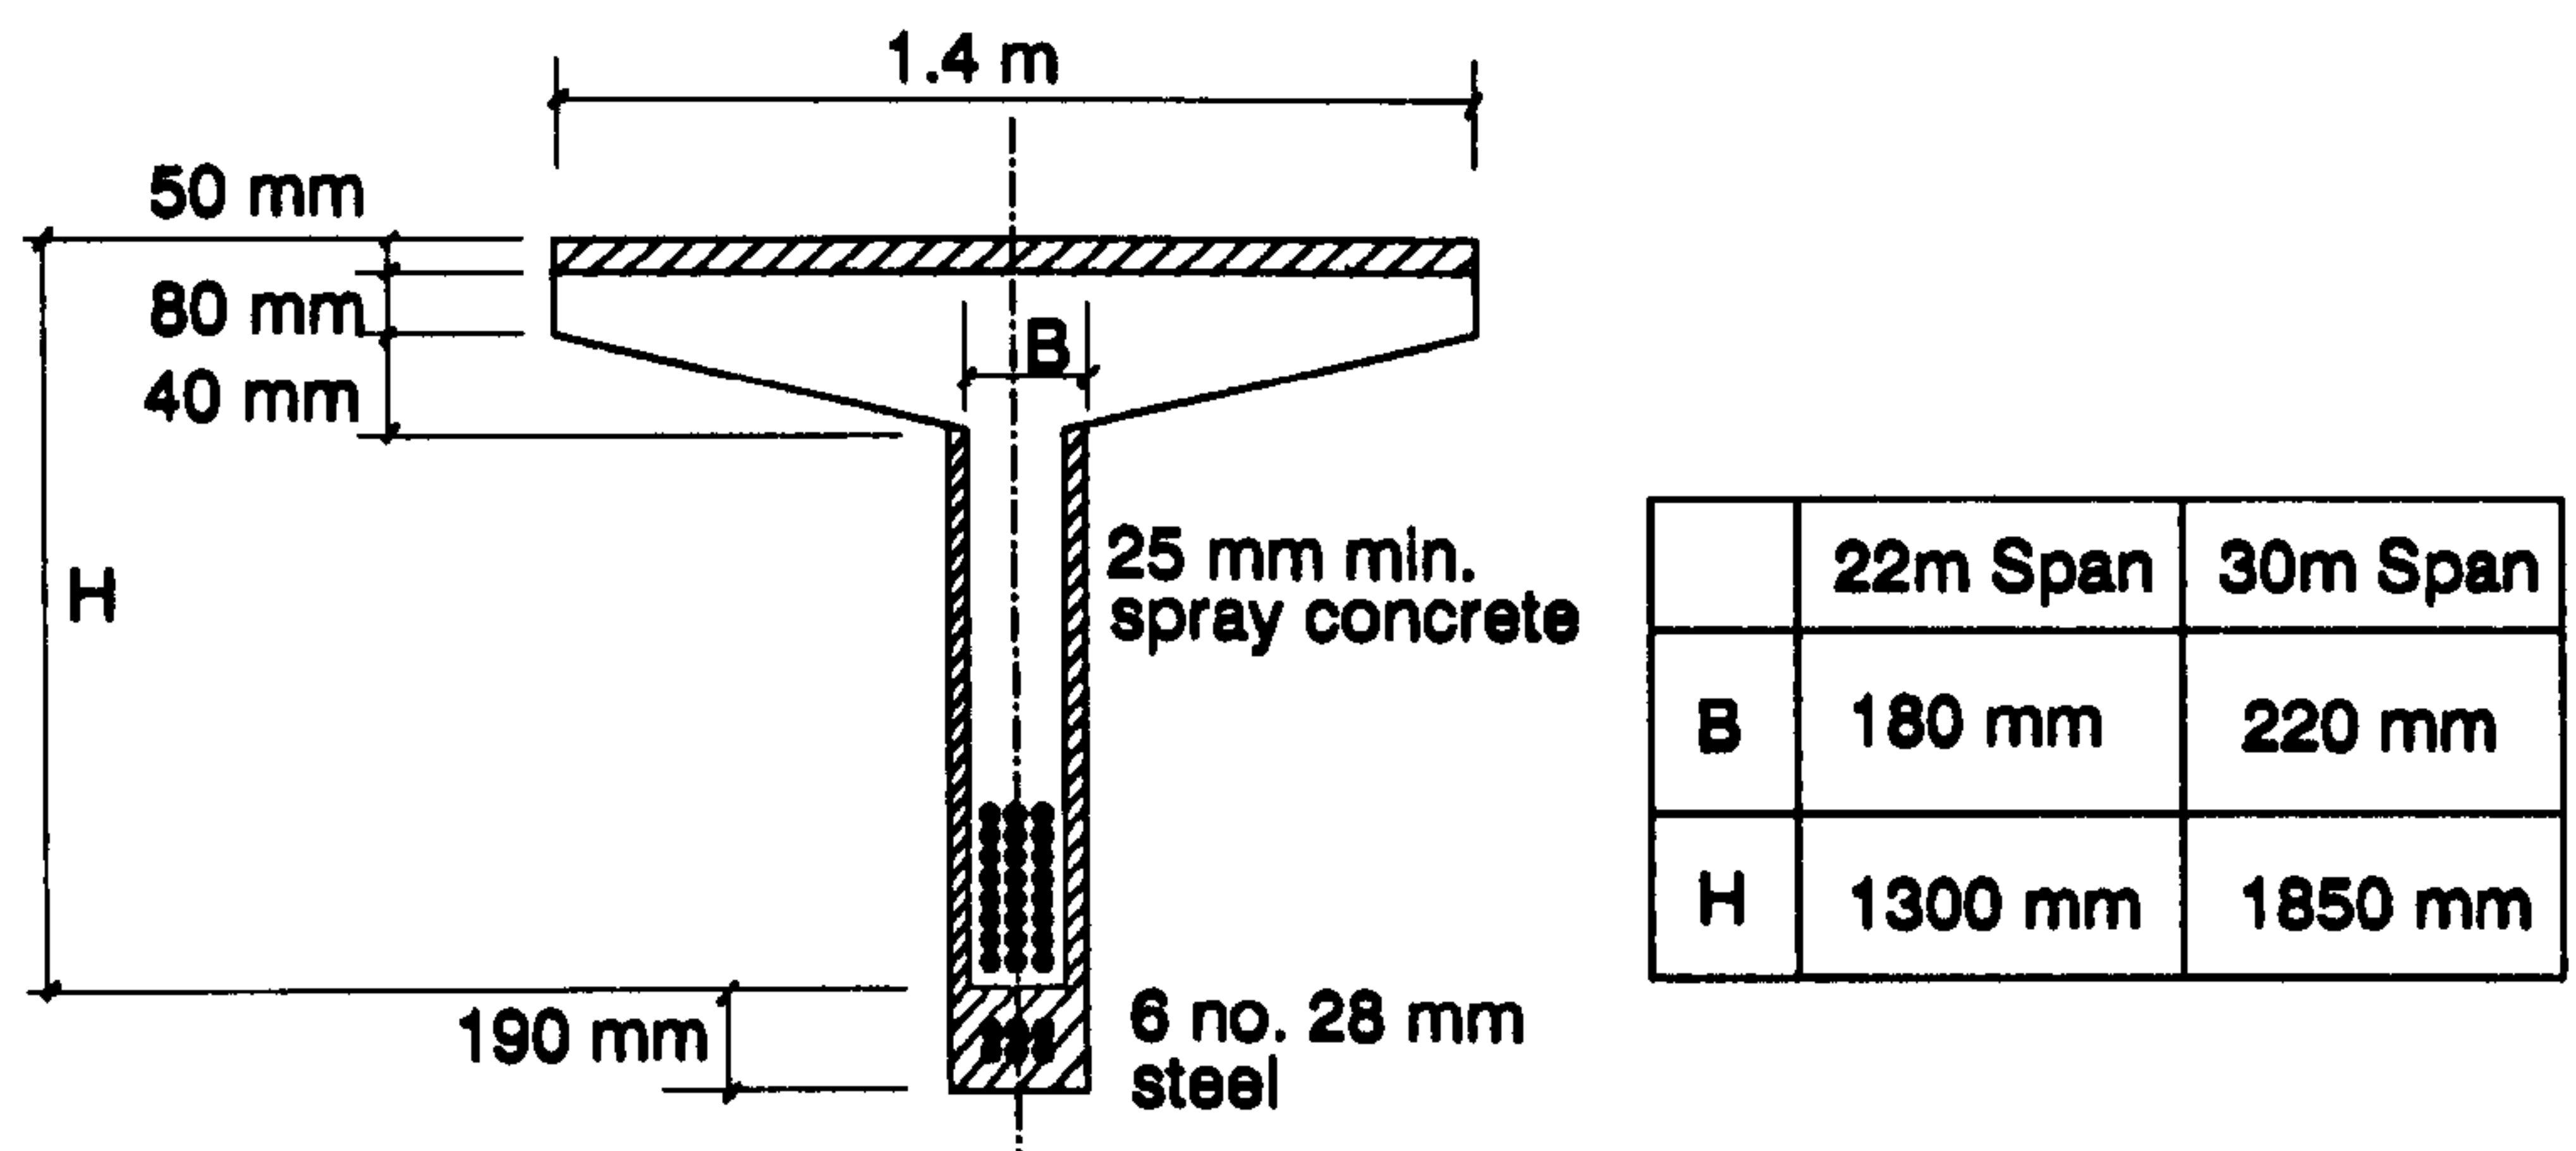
Details of Rehabilitation at Midspan of Yuan Dun Bridge Beams
